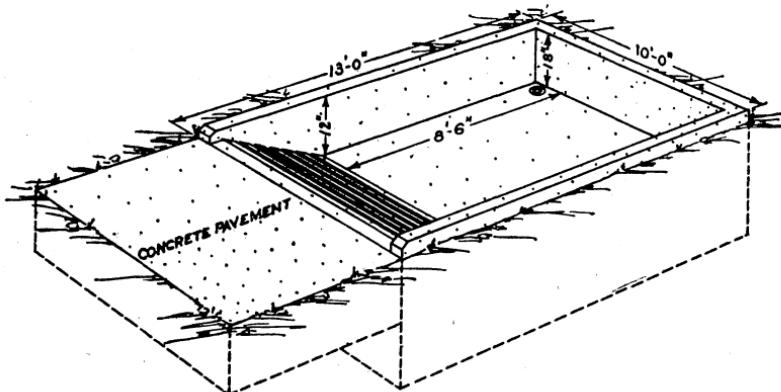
Detailed plan for construction of hog wallow. (Design No. 2129)
